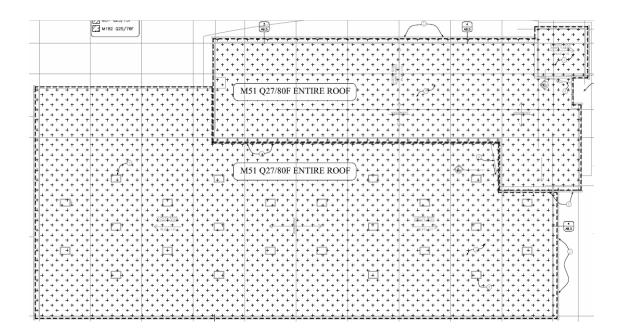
PCM INSTALLED UNDERNEATH THE ROOF SHEETING IN THE NEWLY CONSTRUCTED TRAINING CENTER
